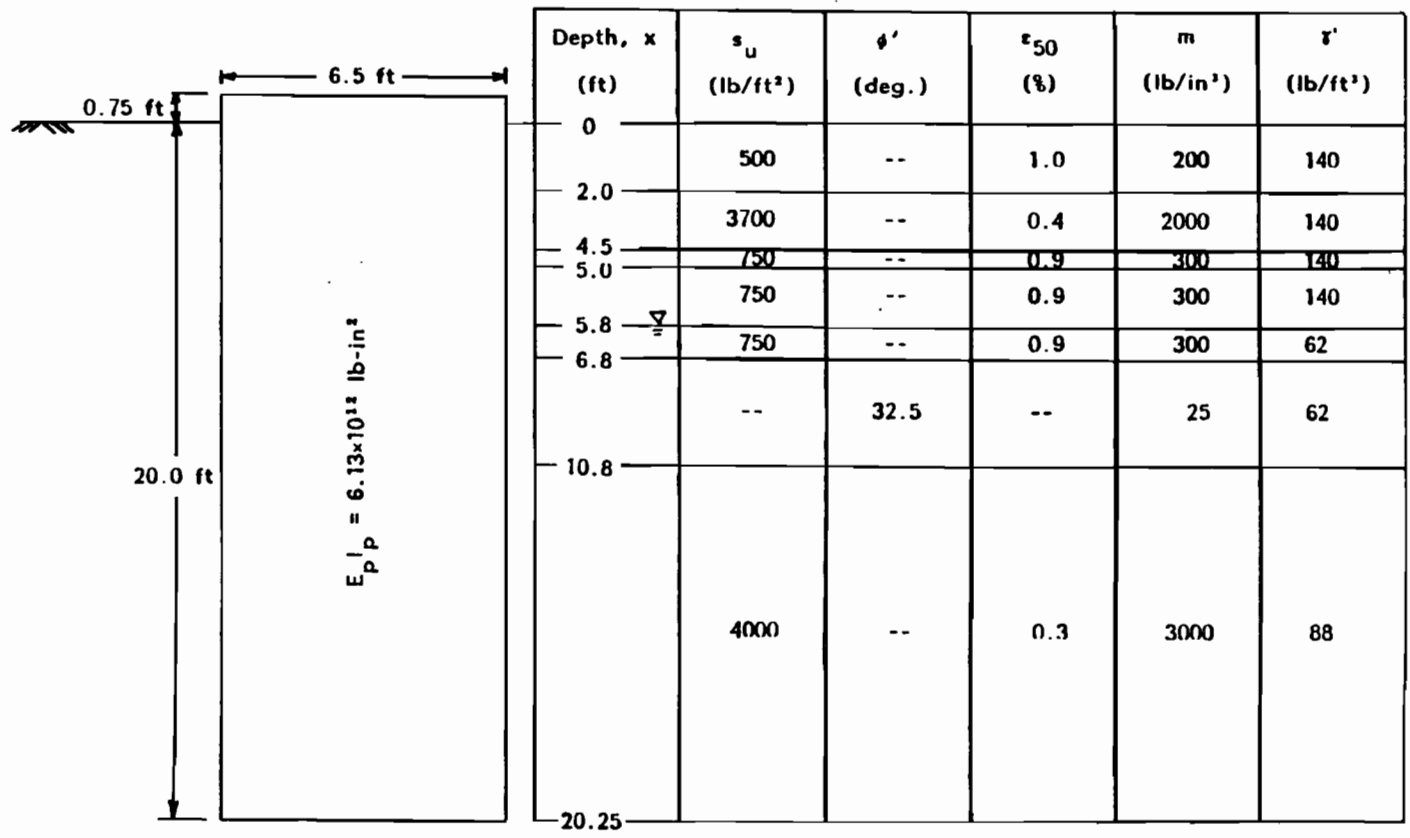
Soil and Drilled Shaft Data Used for COM624 Input, Shaft No. 9.
